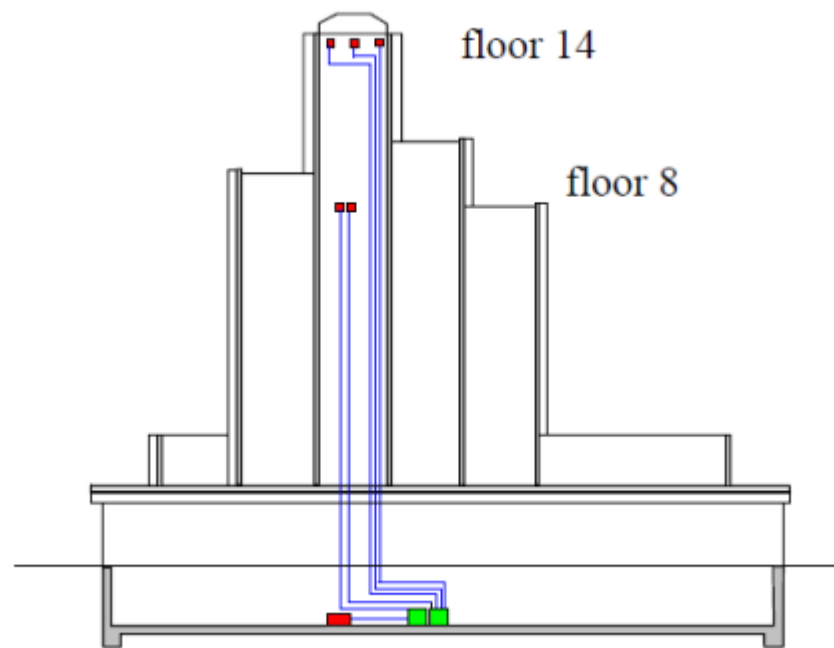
A 14-storey reinforced concrete building tested by Zdraveski and Mickoski [11]
